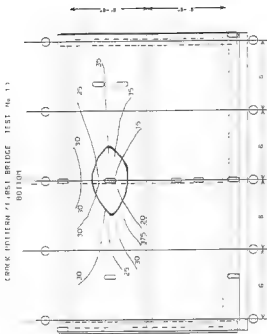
Bottom Cracking Pattern (First Bridge - Test No 1)
